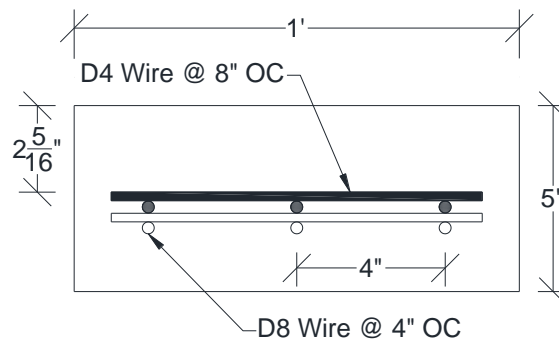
Detailing for Beam Test Specimen with 3-in. Splice Lengths Utilizing D8/D4 Wire Mesh
